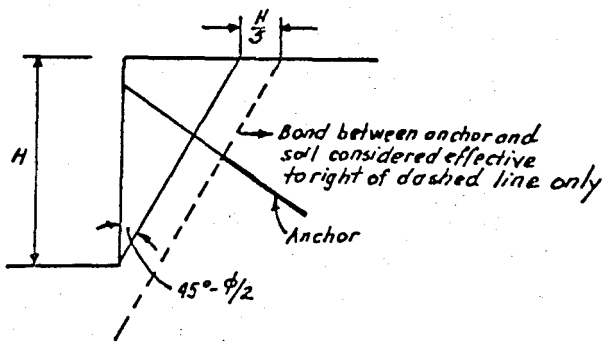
Limits beyond which the Anchorages of Tiebacks must be located to avoid general failure (after Peck, 1974).
